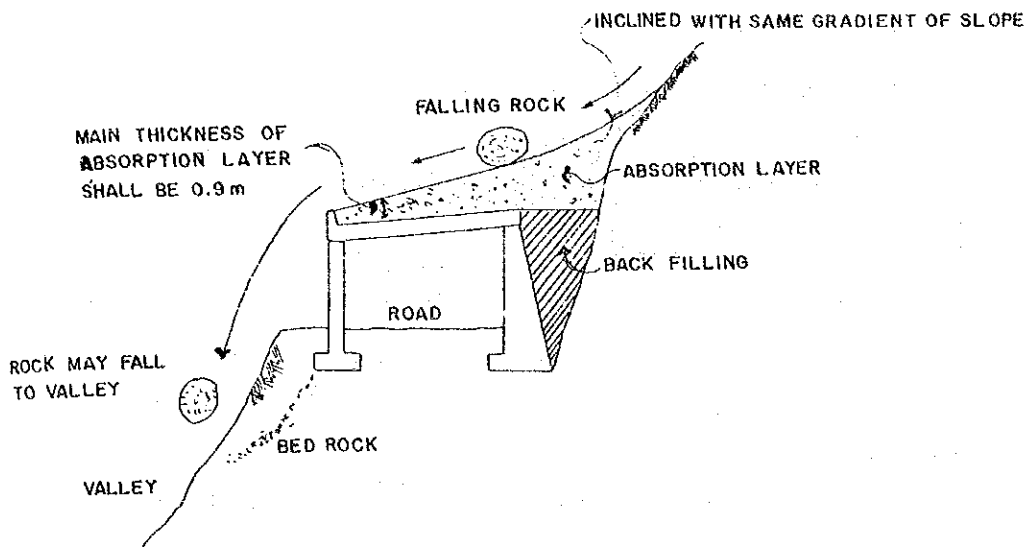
ROCK SHED FOR A ROAD IN BETWEEN A MOUNTAIN AND A VALLEY.
